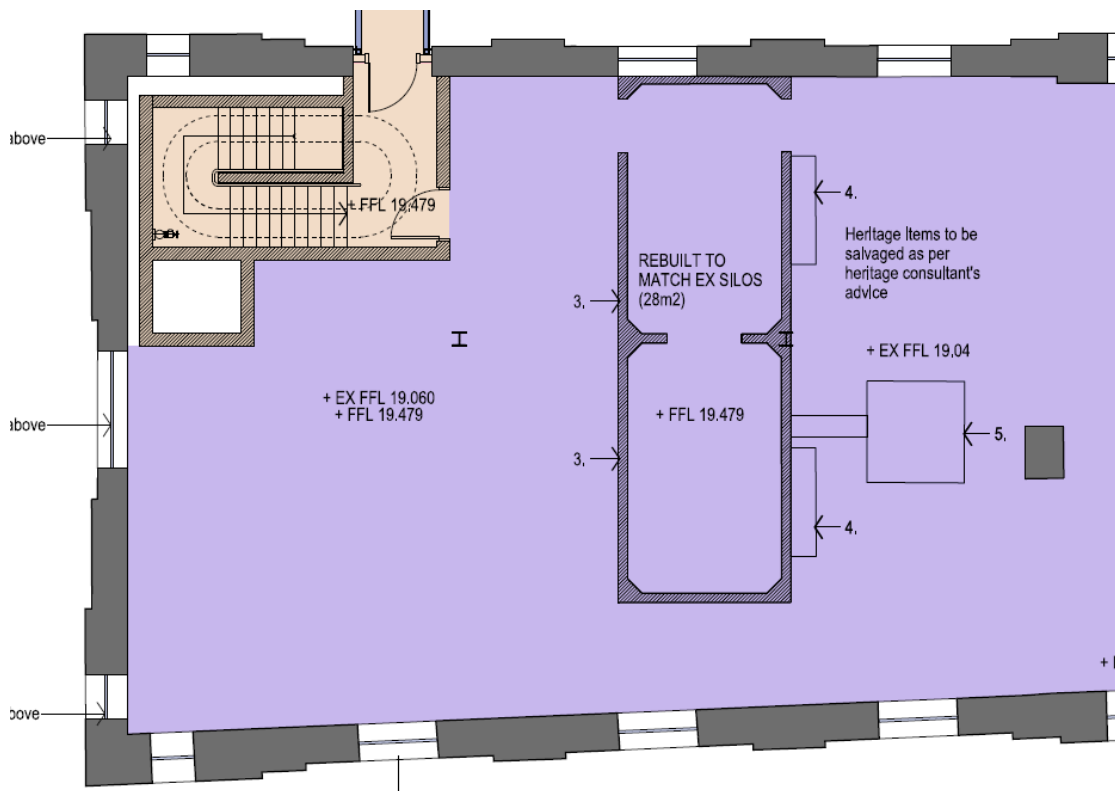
Part plan of proposed level 1 illustrating reconstruction of malt silos and location of interpretative equipment.
